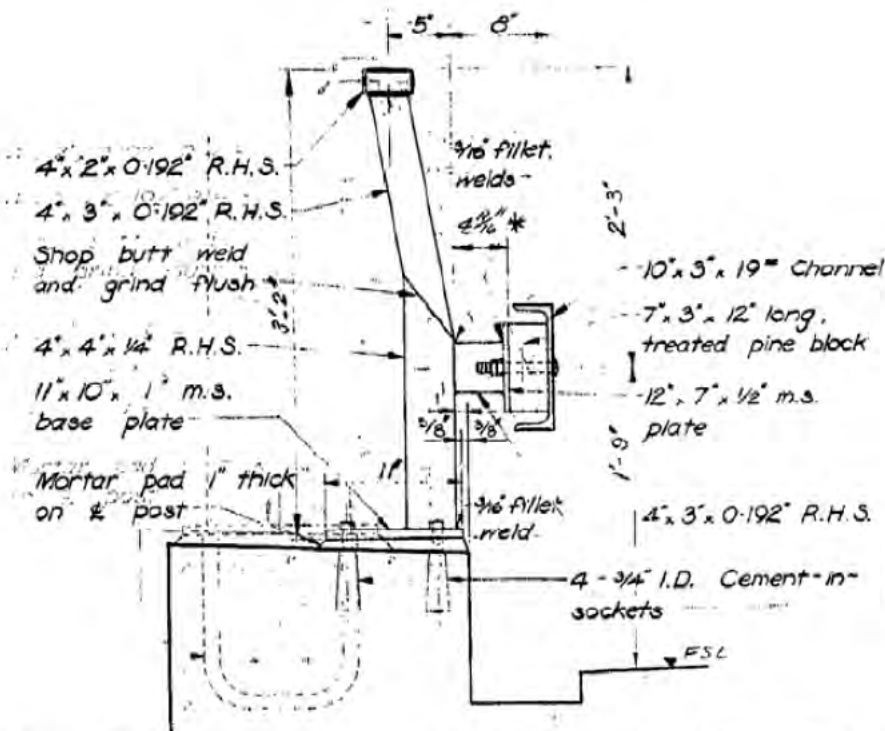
Bowen Street Overpass - Barrier Detail from Construction Drawings (Designed in 1971)
